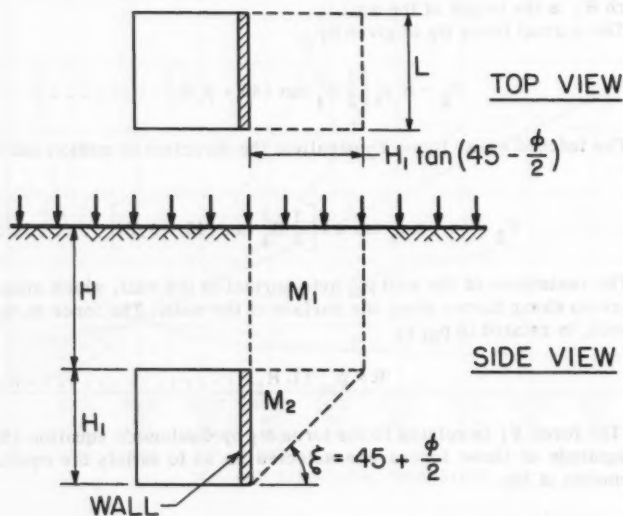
ASSUMED SLIP PLANES FOR RECTANGULAR WALL
